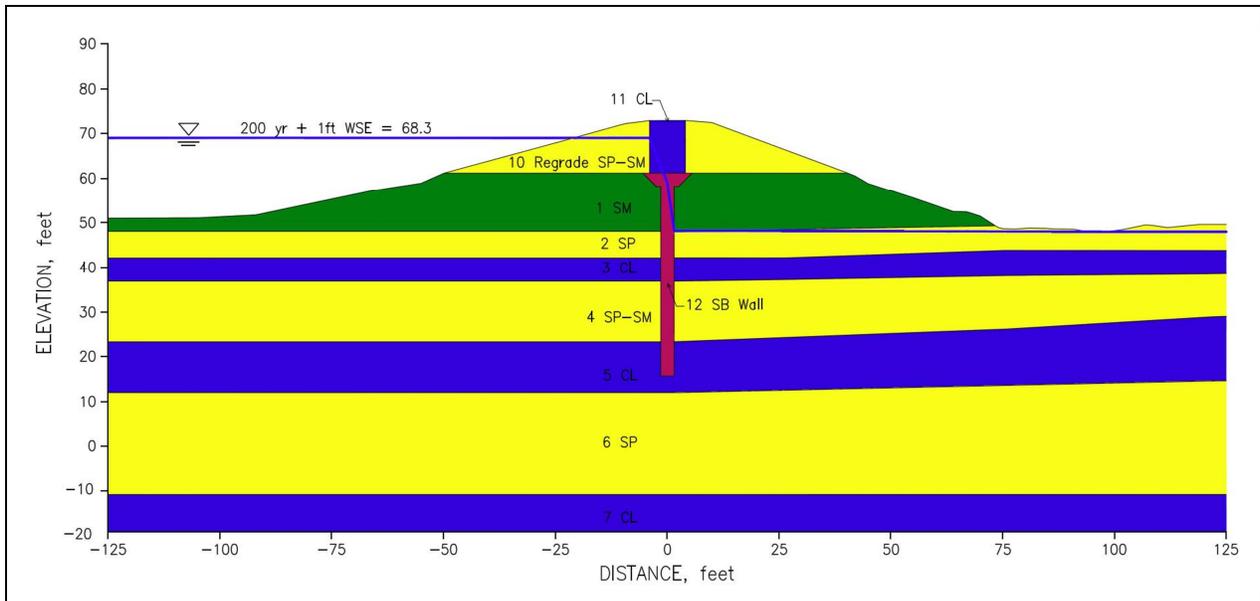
Typical Cross Section of Stitching Cutoff Wall Creating a Thickened Blanket
